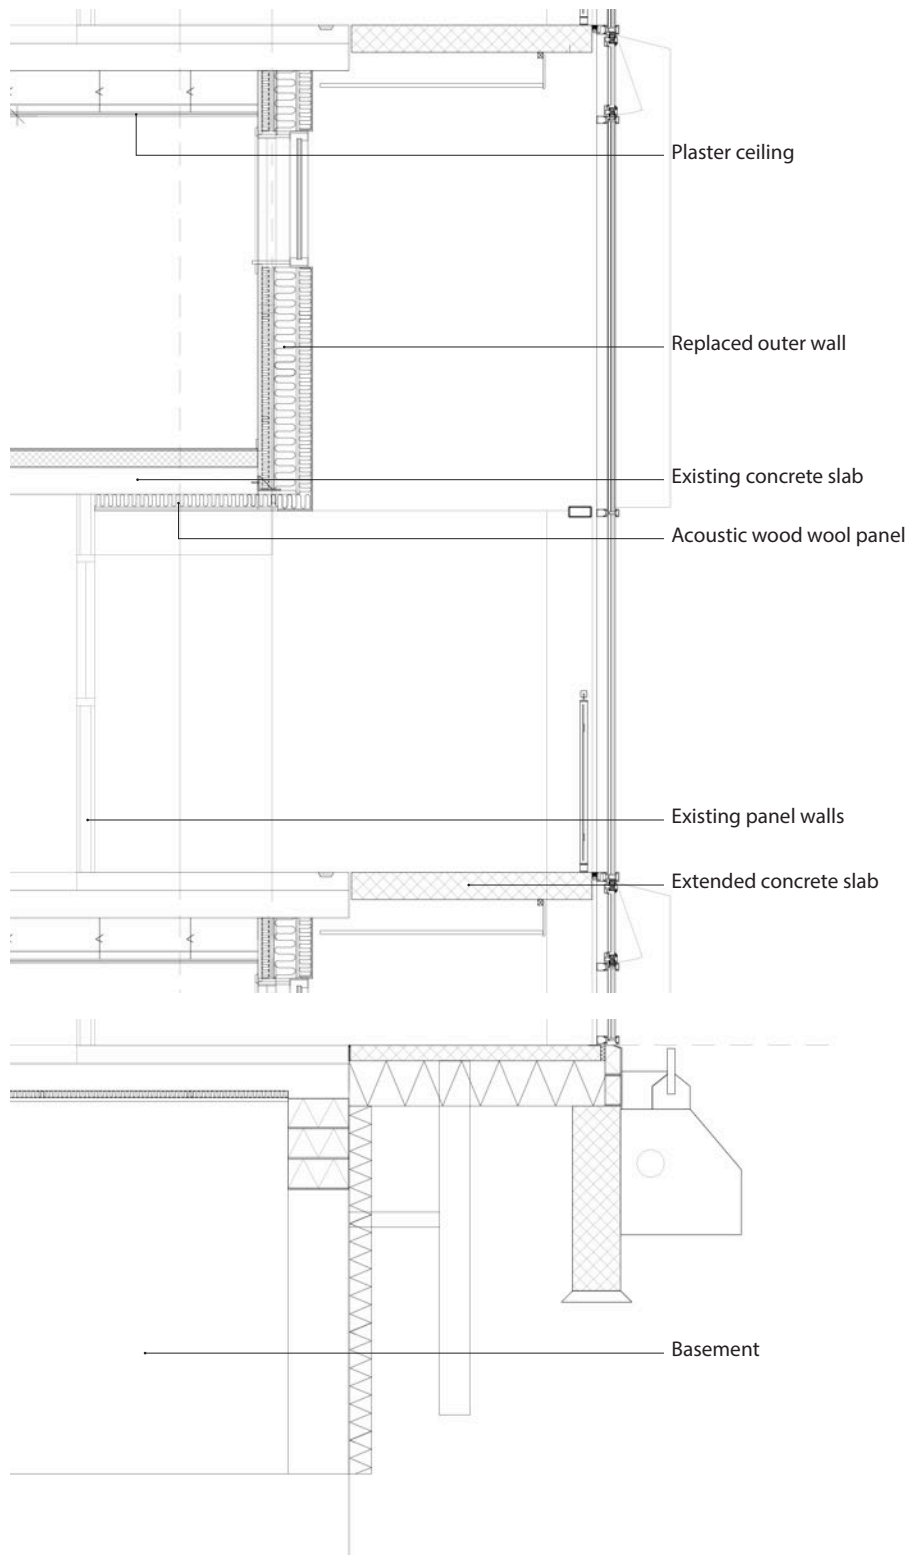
Tove Ditlevsensvej. Construction section through north elevation (1:50)
